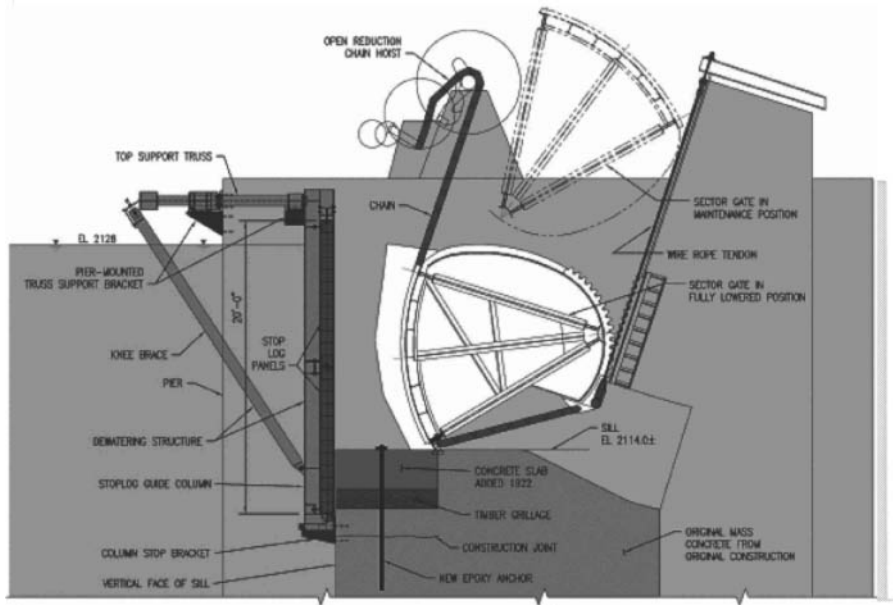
Cross Section of Sector Gate, Civil Structure and Dewatering System
